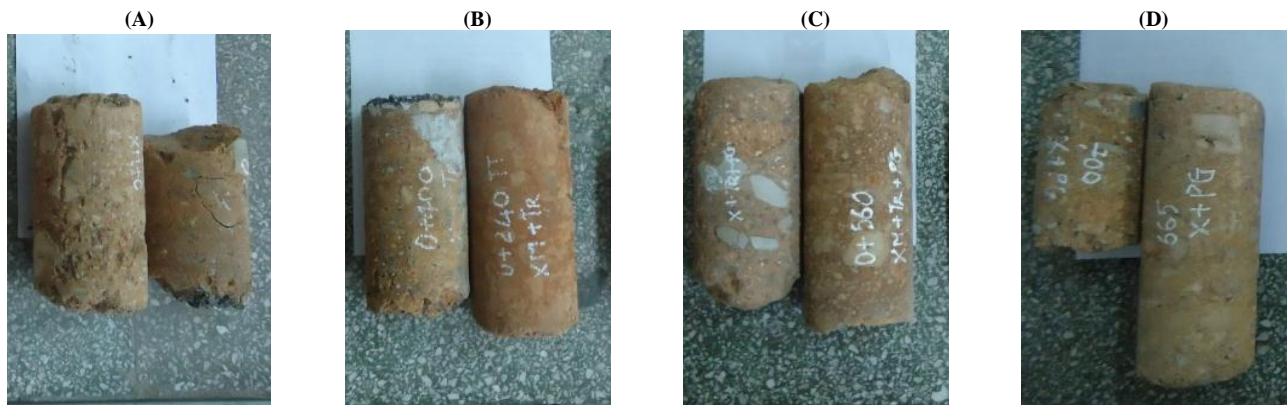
Sample Extraction from the Four Road Segments: A) Mix 1; B) Mix 2; C) Mix 3; D) Mix 4.
